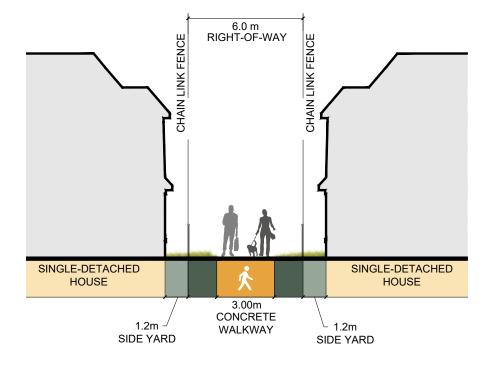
D-D' 6.0m Pedestrian Walkway R.O.W
